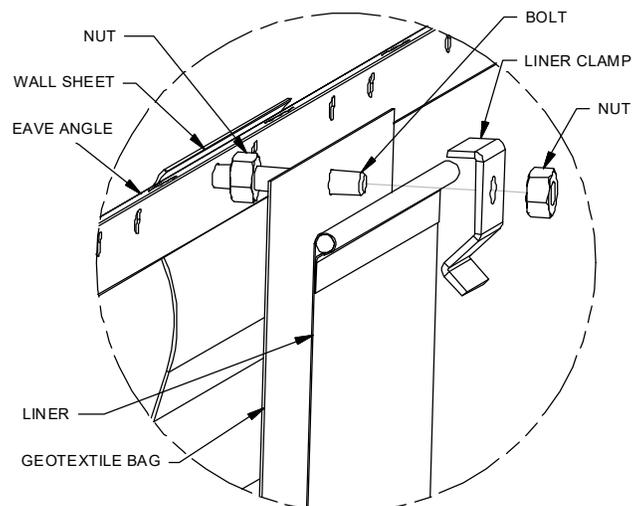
Exploded view of liner/rope, wall sheet and liner clamp
